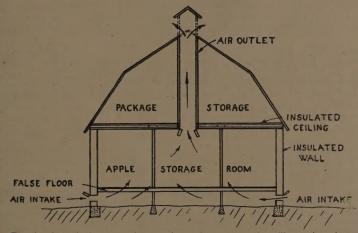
A typical storage house, shown in cross-section, illustrating the principles involved in the ventilation system. Open the air intakes and outlets whenever the outdoor temperatures are lower than those in the storage; close them when the reverse conditions obtain, until the desired storage temperature is reached.
